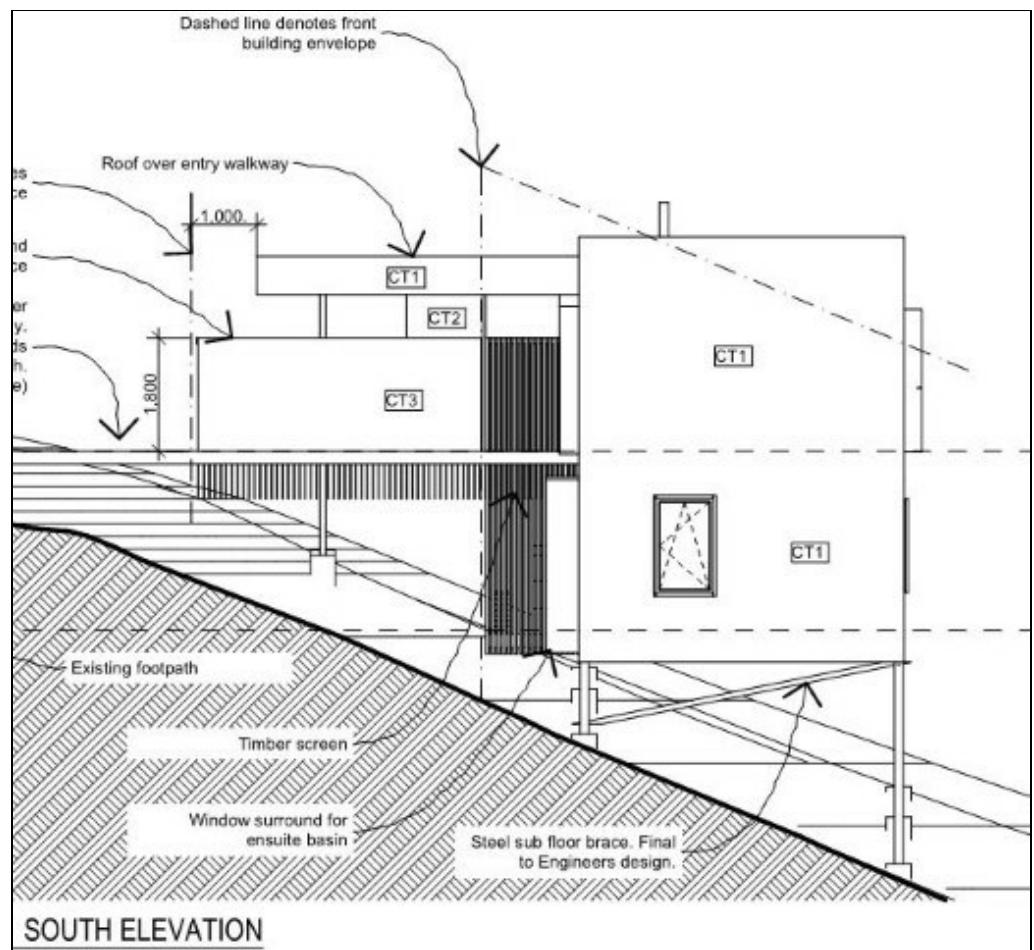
Excerpt from submitted project 1819-14 drawing 202 (14/3/19) showing building envelope over building, southern elevation.
